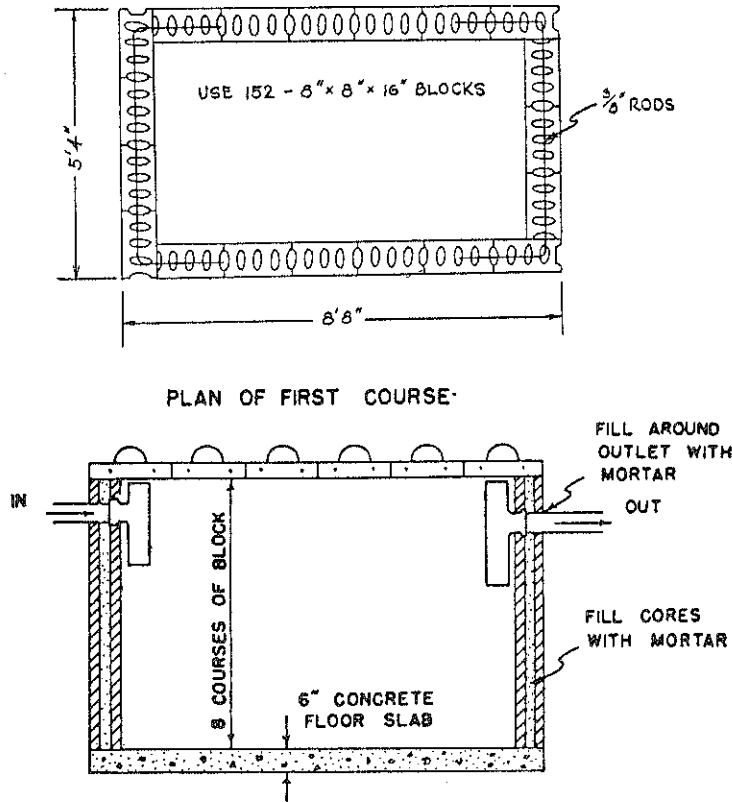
Concrete blocks may be used for the walls of the septic tank. Fill all the cores with concrete and reinforce the corners. This is a 750-gallon septic tank.
